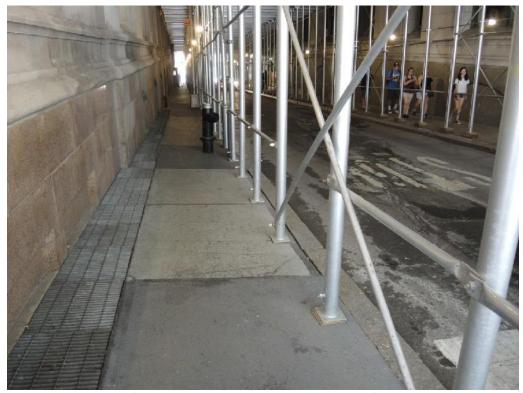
Thames Street roadbed with sidewalk shed scaffolding. Note manholes in foreground. Trinity Place is in far background. View looking northwest.
